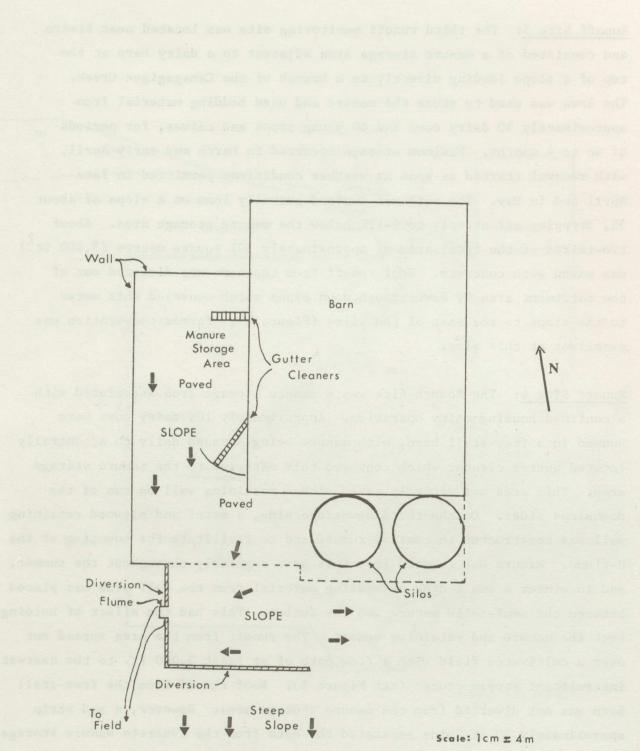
Sketch Plan of Manure Storage, Site #3
